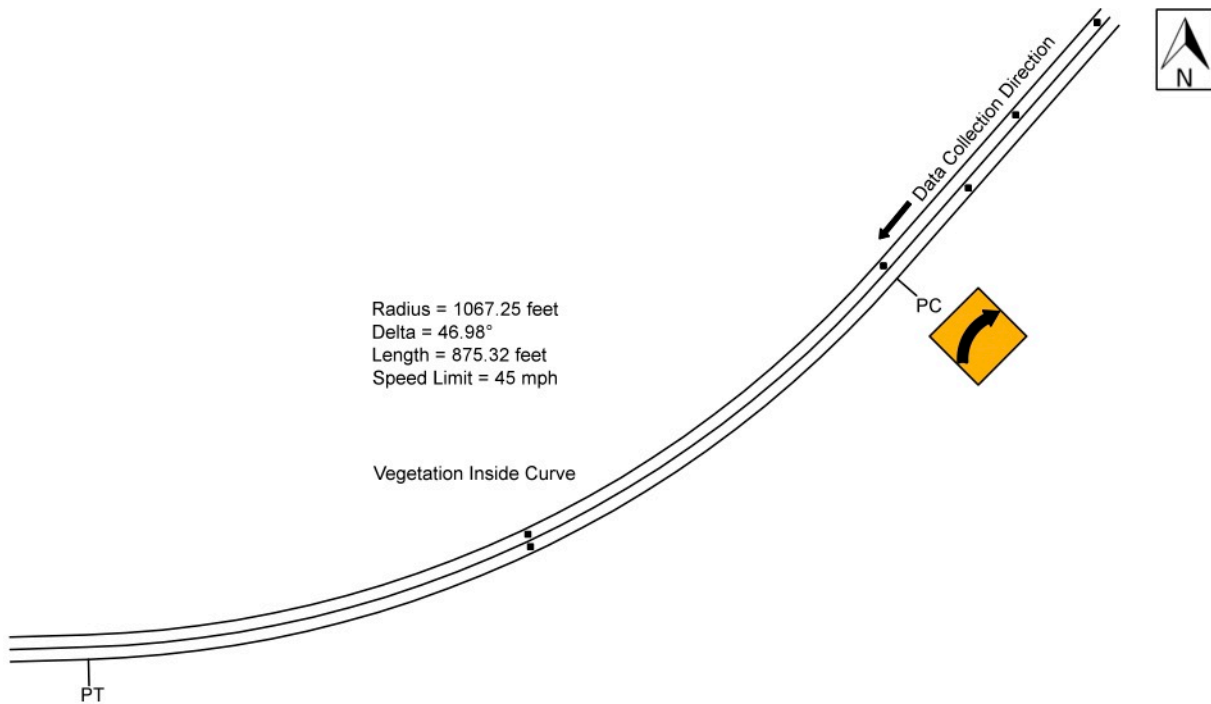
Diagram. Geometric layout of southbound Diamond Bar Road in the after periods (not to scale).
